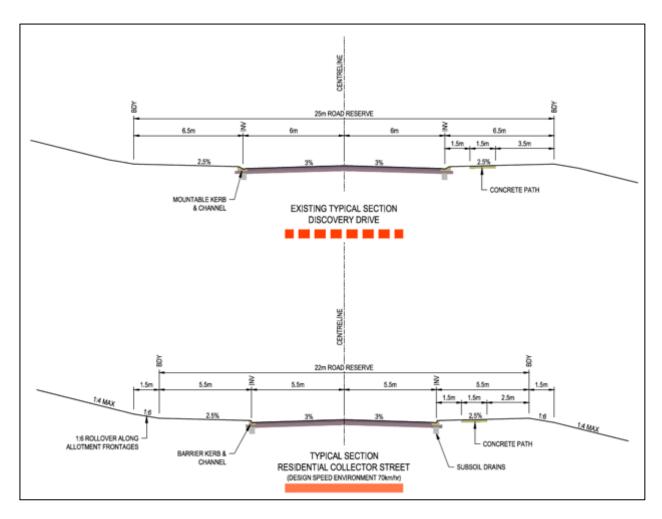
EXISTING AND PROPOSED ROAD CROSS-SECTIONS
